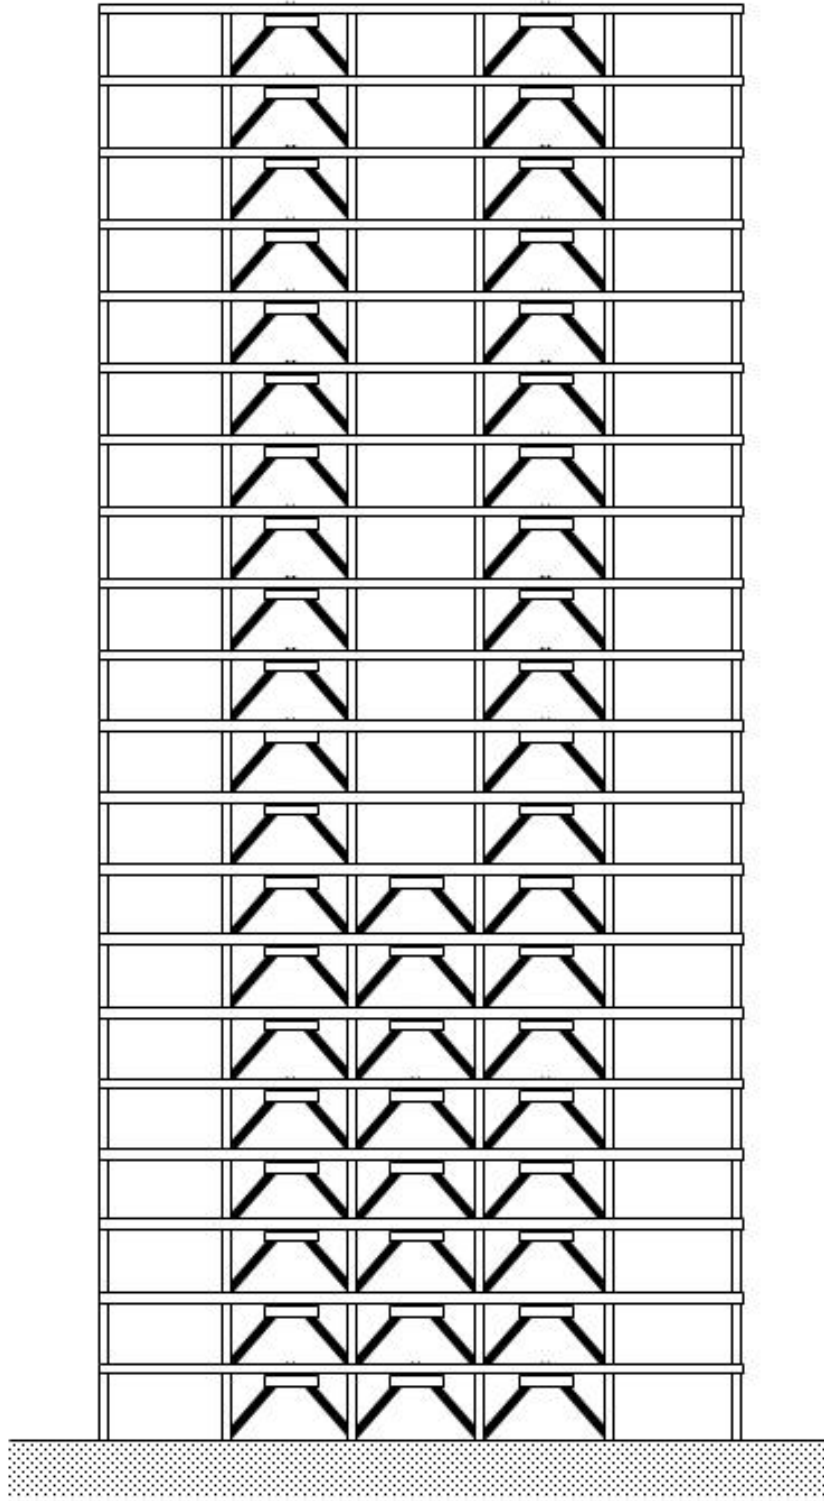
Los Angeles 20 story building structure equipped with MR dampers
